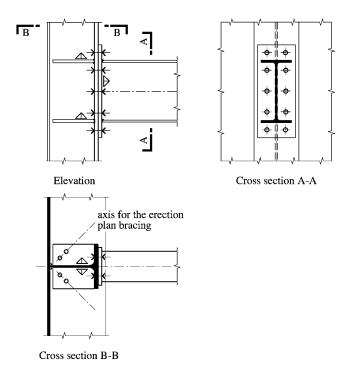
Examples of details for a bolted frame cross bracing.
